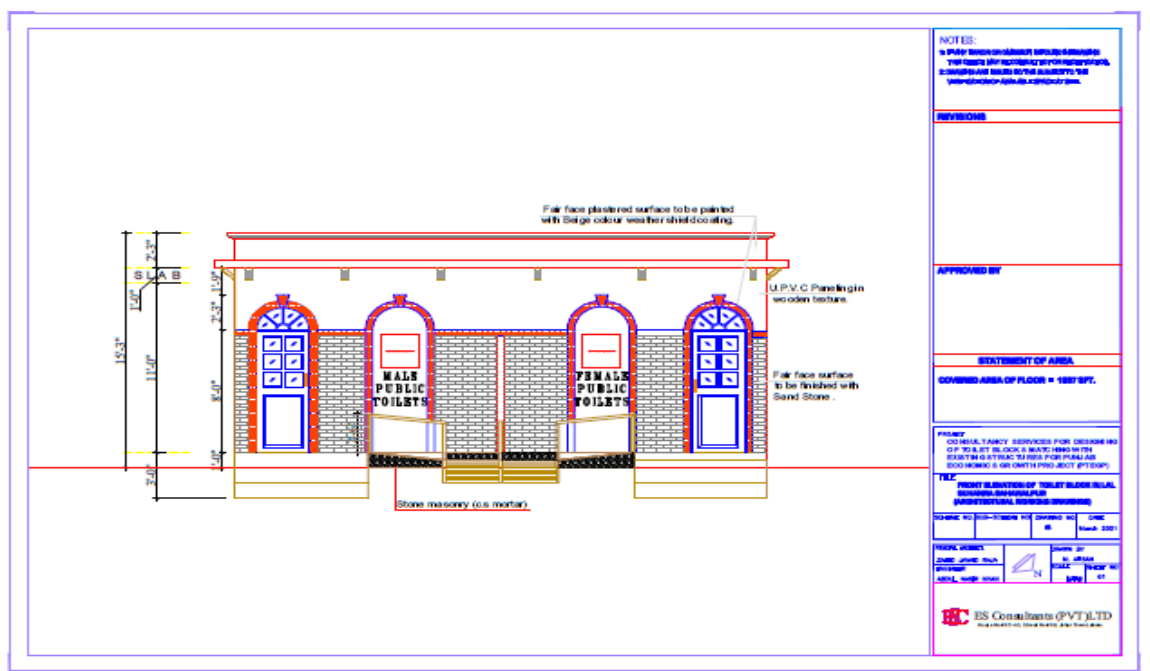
Front Elevation of the proposed toilet block at Lal Suhanra
